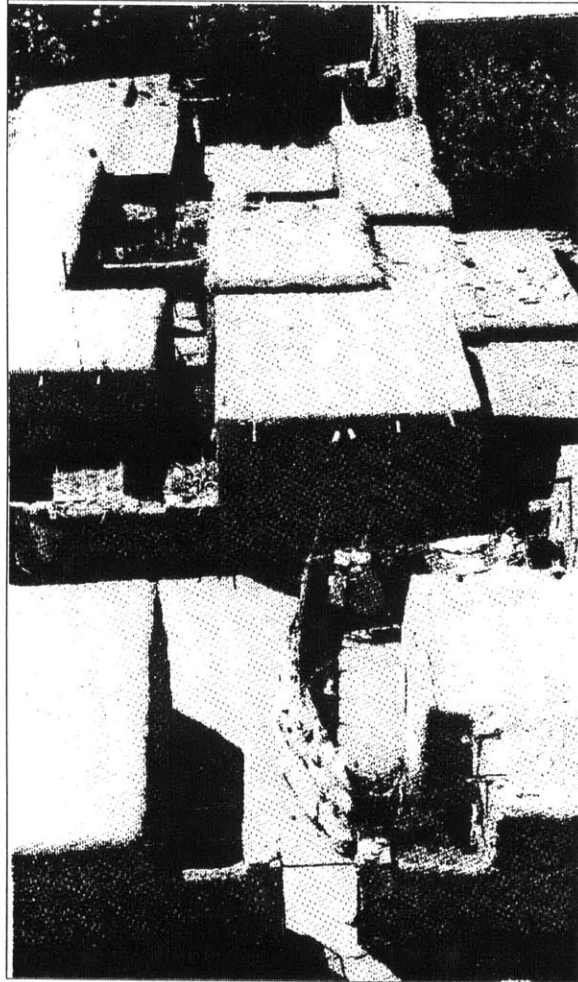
Compact grouping of houses provides maximum shading on exterior walls.
